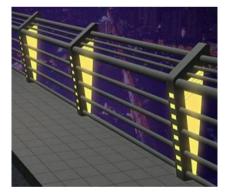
Horizontal railing example 2 图 8. 横线条栏杆示例二
